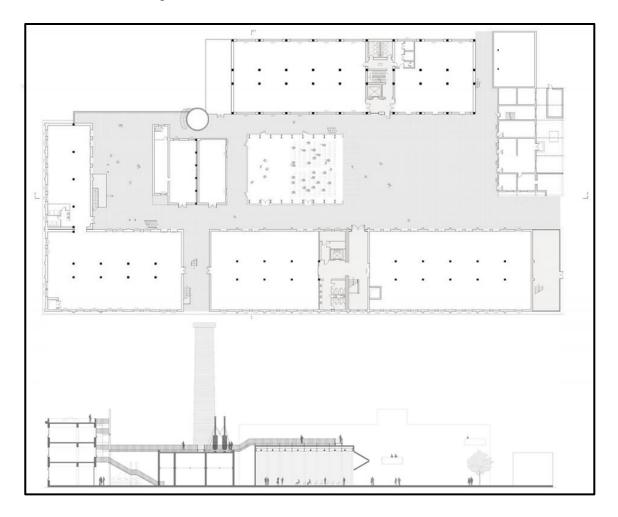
Ground floor plan and section, 77 Culture Park, Origin Architect, 2011 [293]
